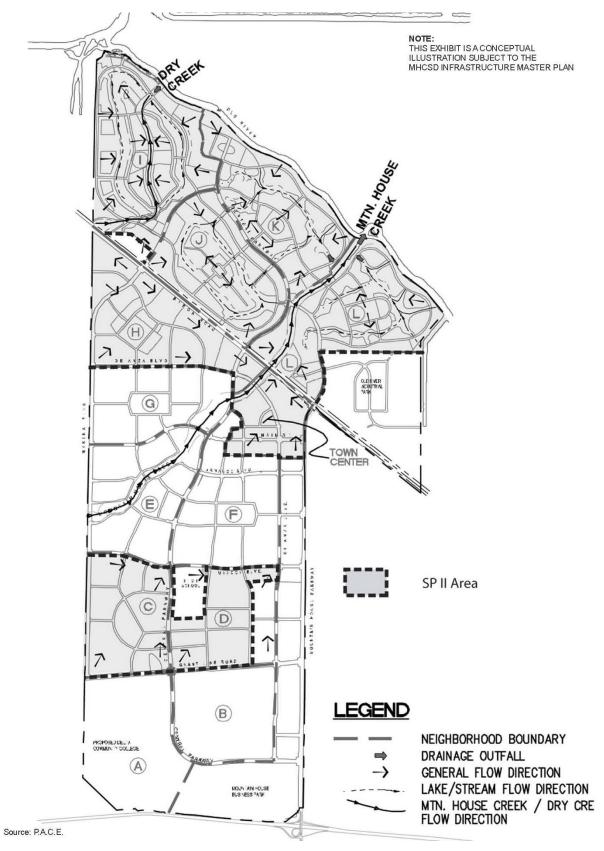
SPII STORM DRAINAGE SYSTEM
